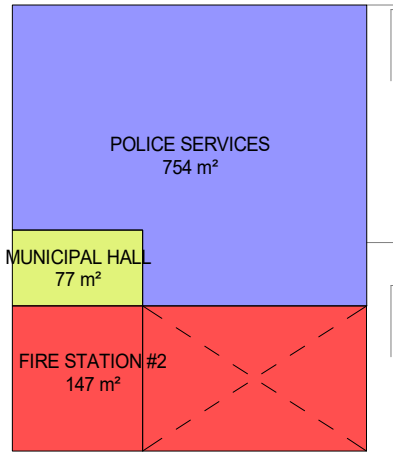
Hovey Road Site Concept: Site Distribution Concept 2
